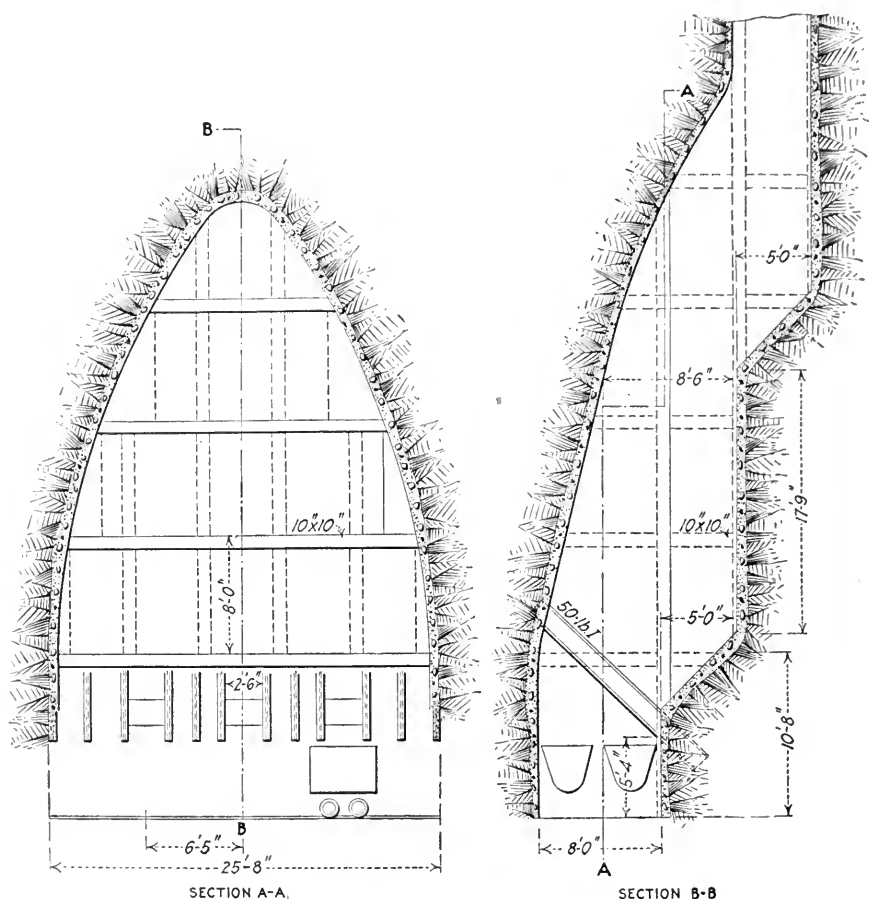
VERTICAL SECTIONS OF A CONCRETE-LINED STOPE POCKET.
